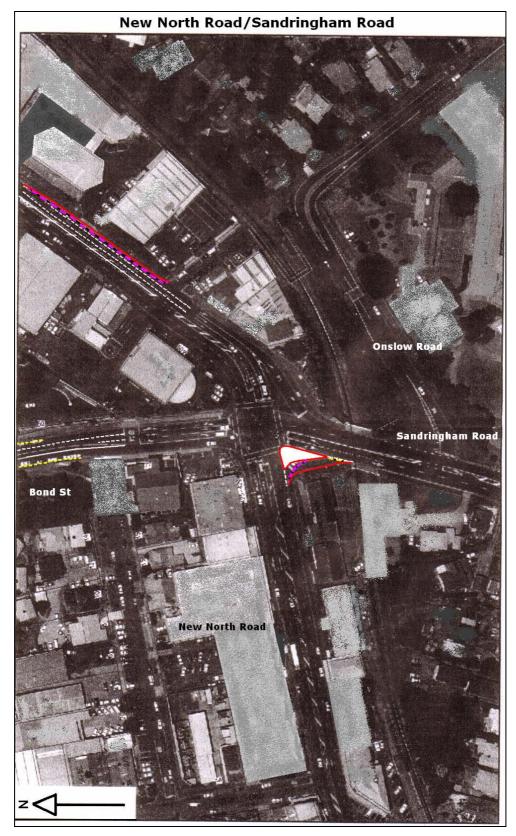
Feasibility plan of the New North Road/Sandringham Road intersection (not to scale).
